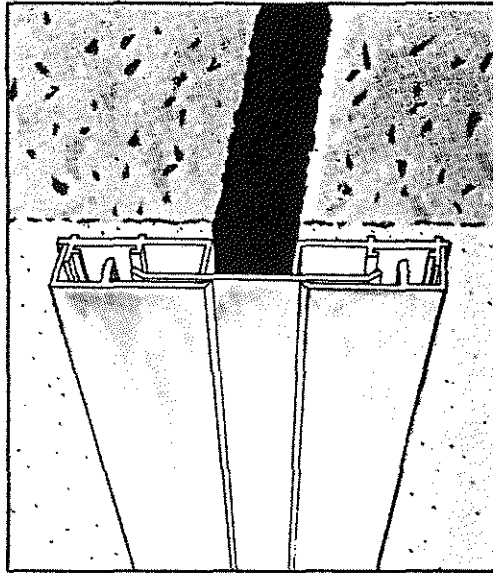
Wall expansion joint cover (courtesy Architectural Art Mfg., Inc.)
